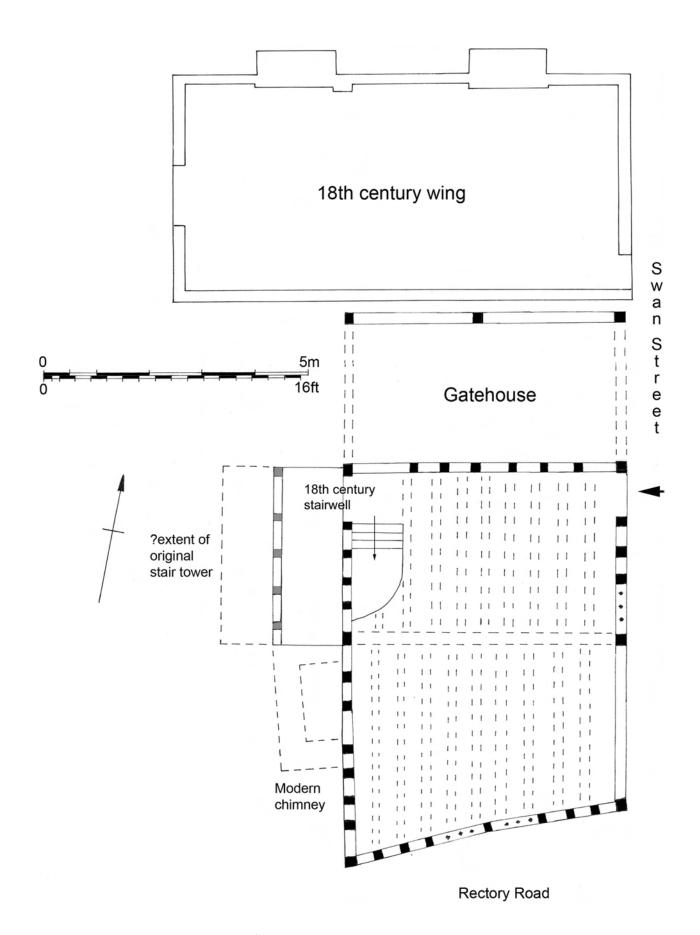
Plan of the ground floor of the Sugar Loaves
